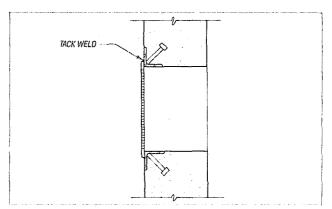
Security vent grille is welded to cast-in-steel angles.
